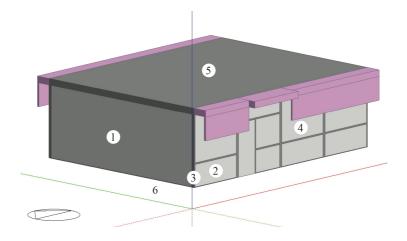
The demountable classroom building Design Builder model. (1) end wall (2) infill panel, (3) steel frame, (4) window, (5) roof
